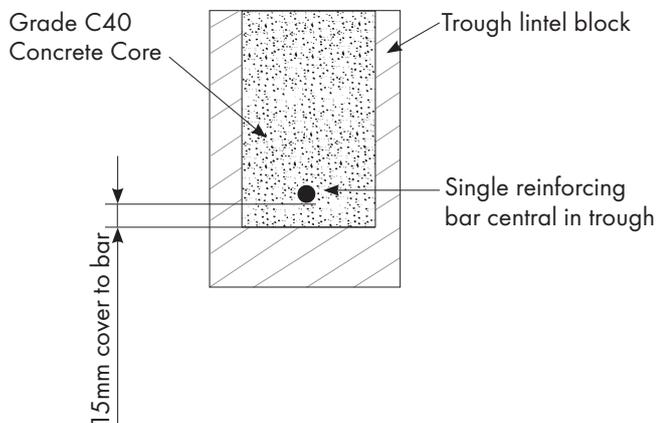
Typical detail of Lintel with Single Reinforcing Bar.
